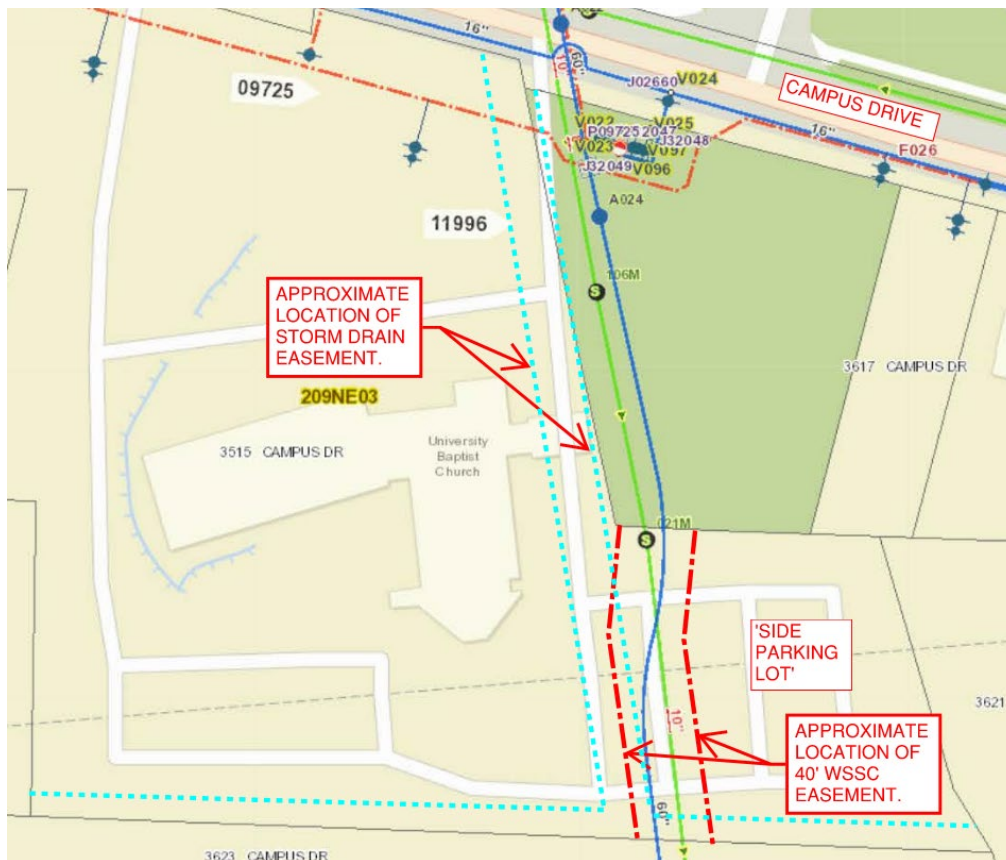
WSSC GIS: WATER AND SEWER LINES AND WSSC AND STORM DRAIN EASEMENTS
